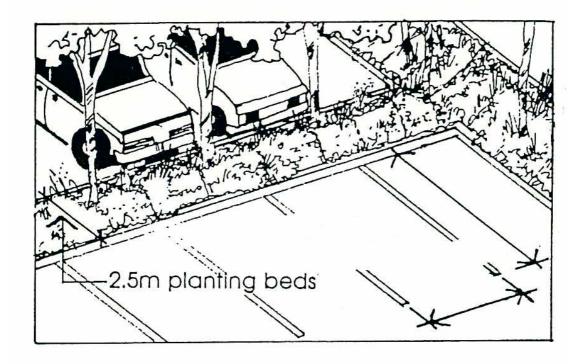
Car park stalls shall be separated by slightly mounted planting beds for shade and wind protection.
